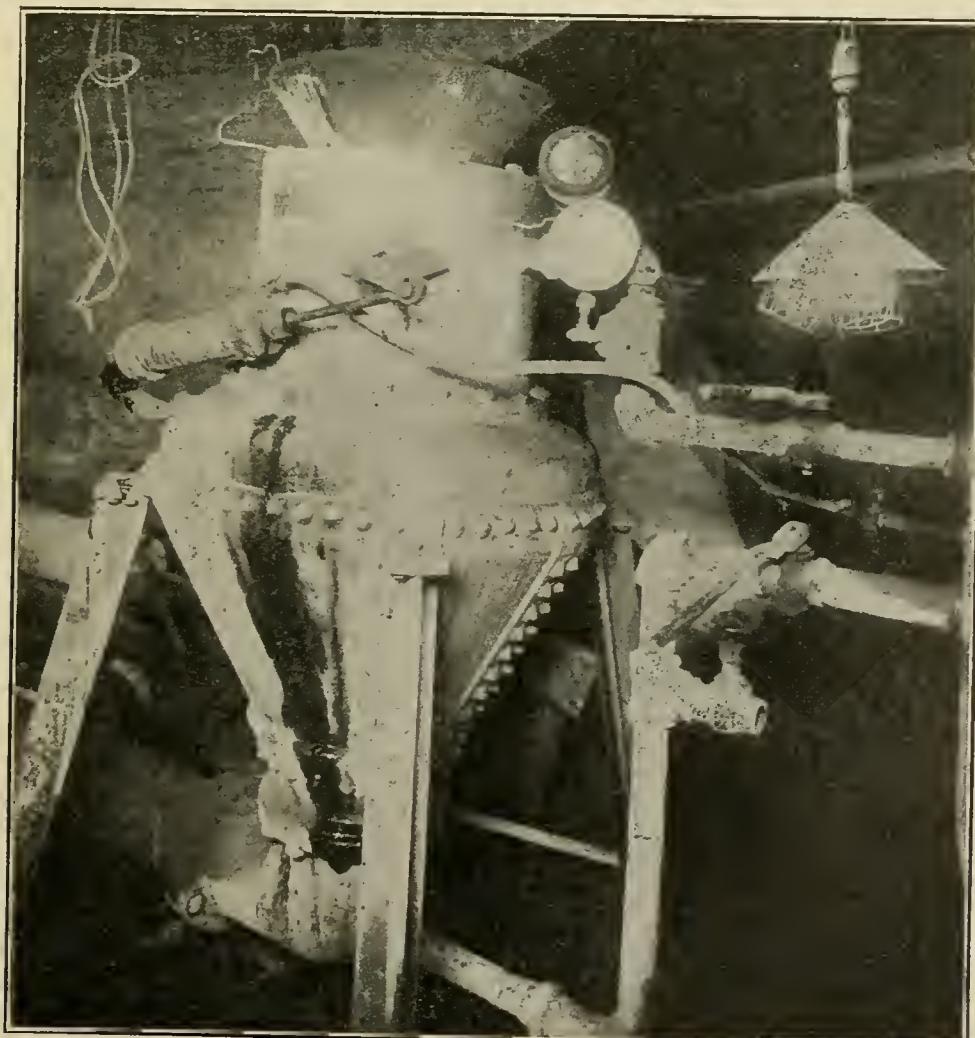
Mixer and Conveyor at Bottom of Shaft.
